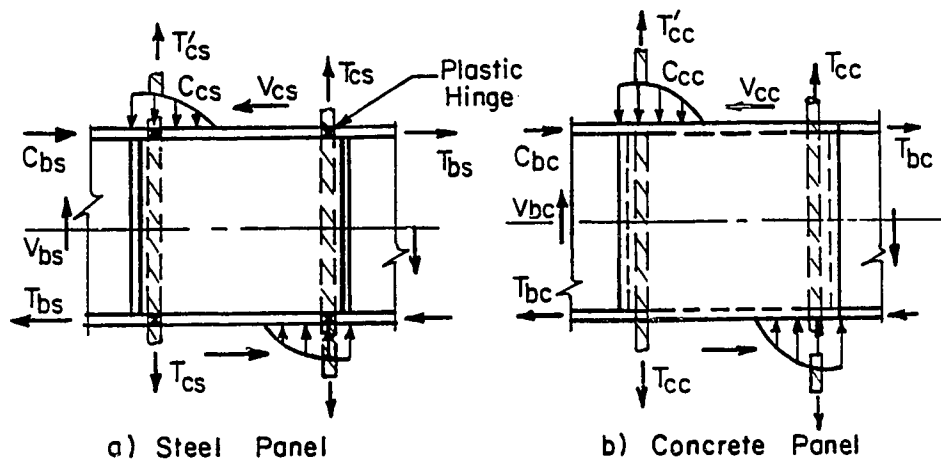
Assignment of external forces to steel and concrete panels.
